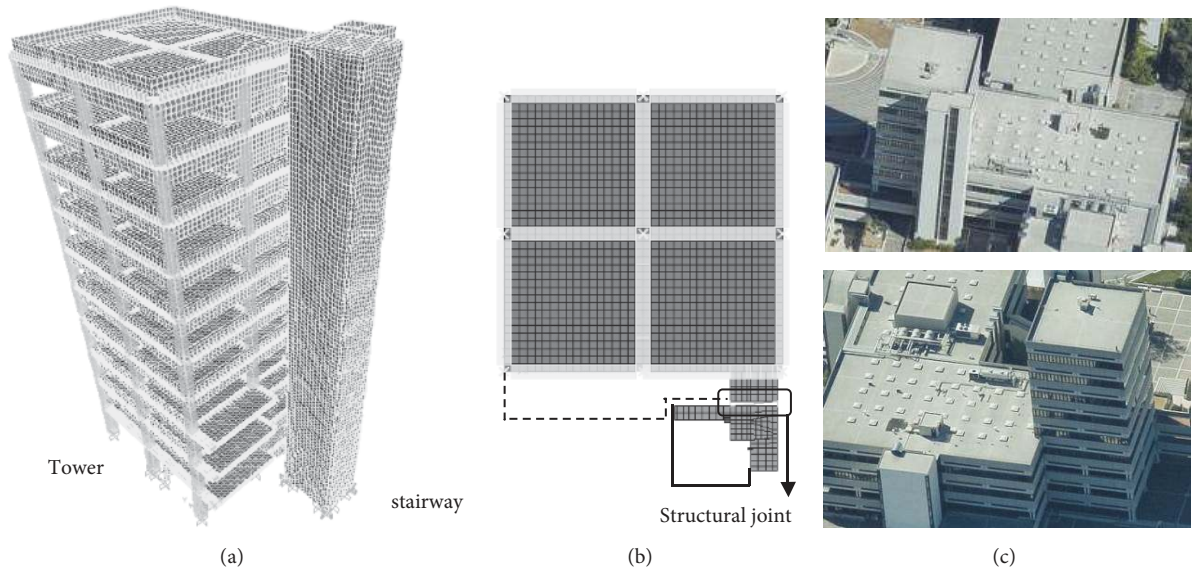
(a) 3D finite element model of the Tower; (b) plan view of the floor slab; (c) Tower interactions with adjacent buildings.
